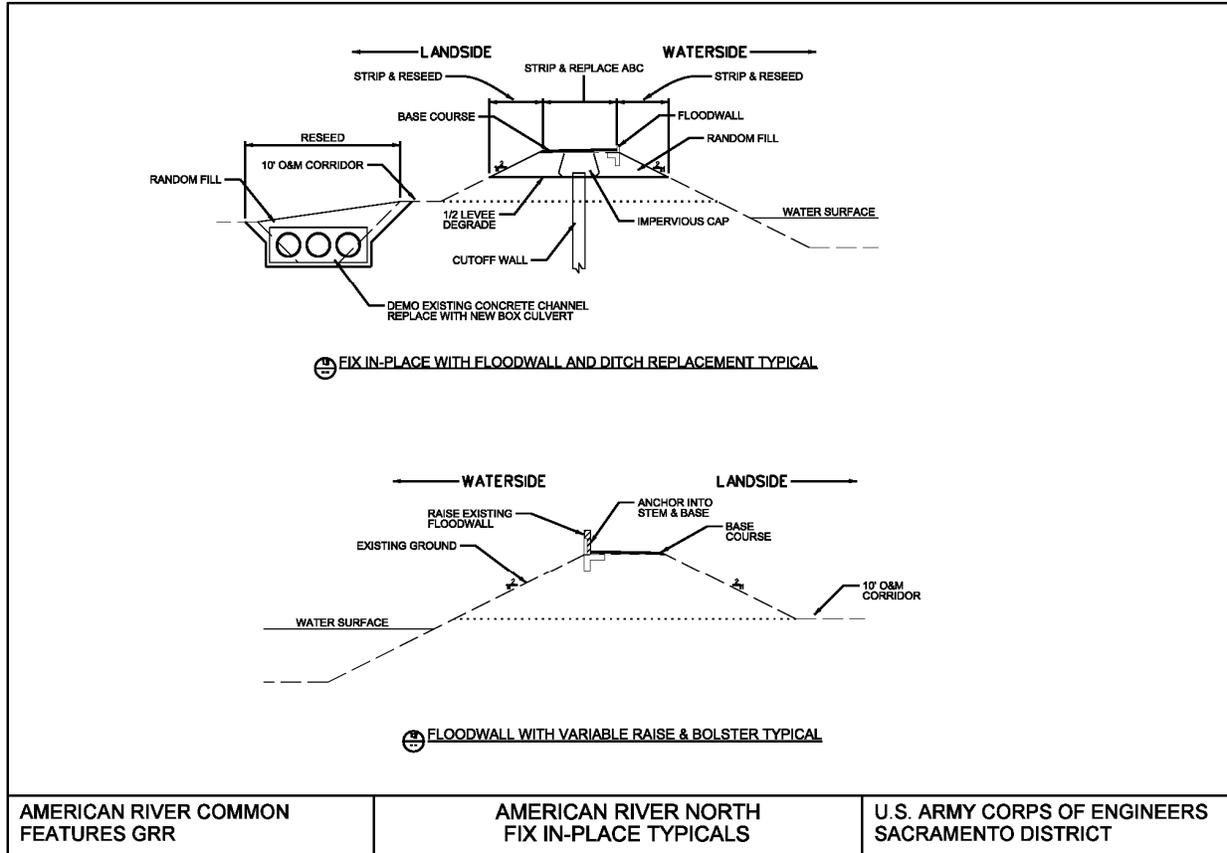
Floodwall with Variable Raise and Bolster Typical.
